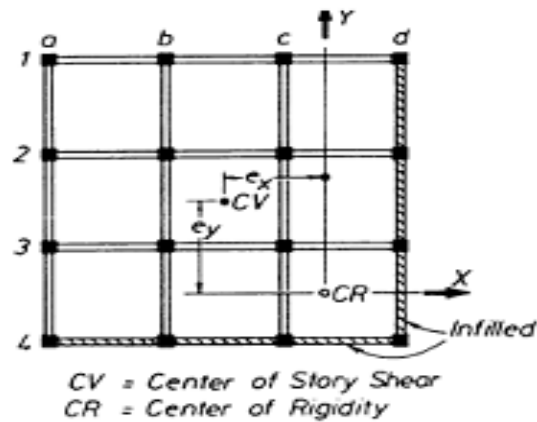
Floor plan of multistory reinforced concrete frame building with infill of two boundary frames. [Pauley and Priestley]¹
